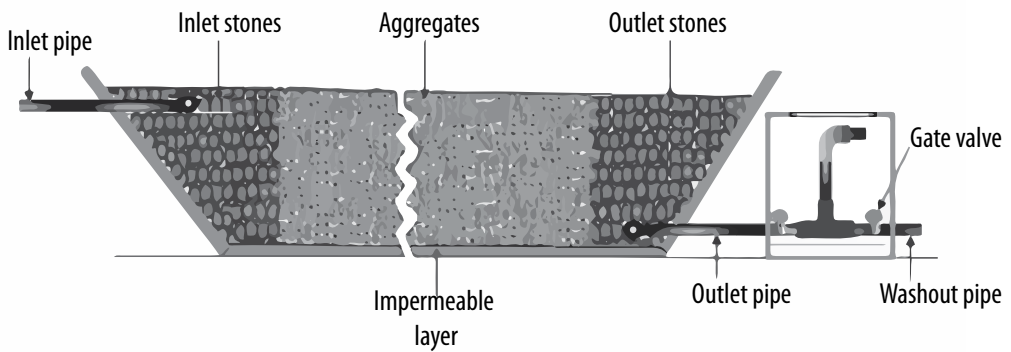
Position of inlet and outlet structures (Njau et al., 2010)
